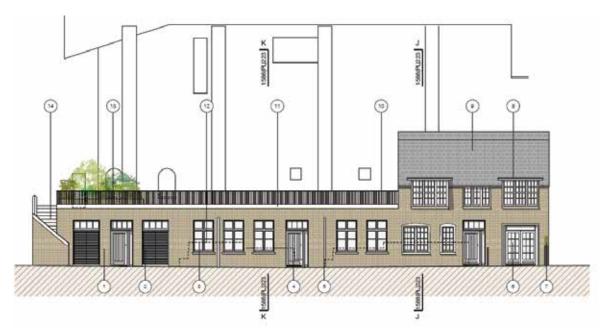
Approved proposed elevation of Aldwych Workshops
